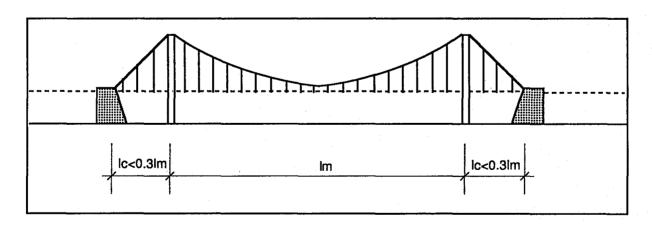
THREE-SPAN SUSPENSION BRIDGE WITH SHORT SIDE SPANS
